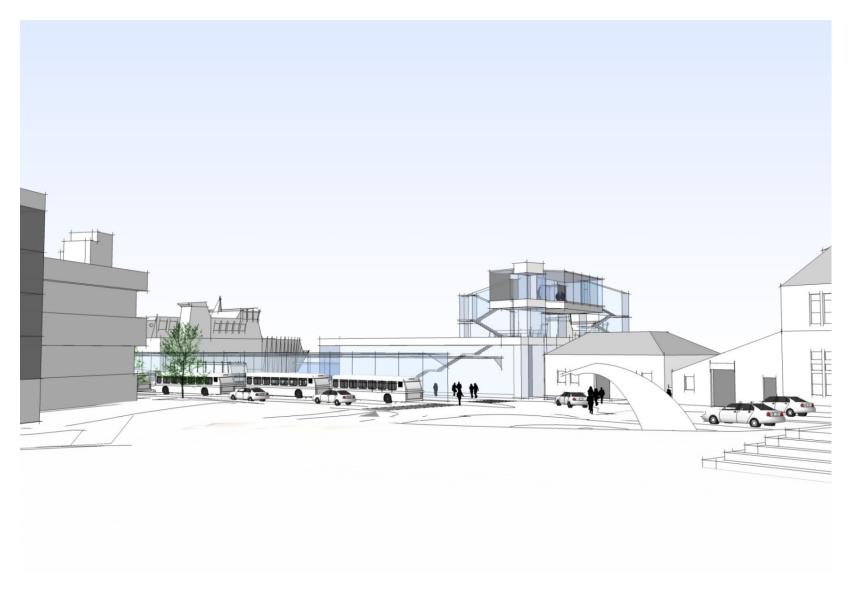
Preferred Alternative with Center Section of Pedestrian Bridge View from the Parade
